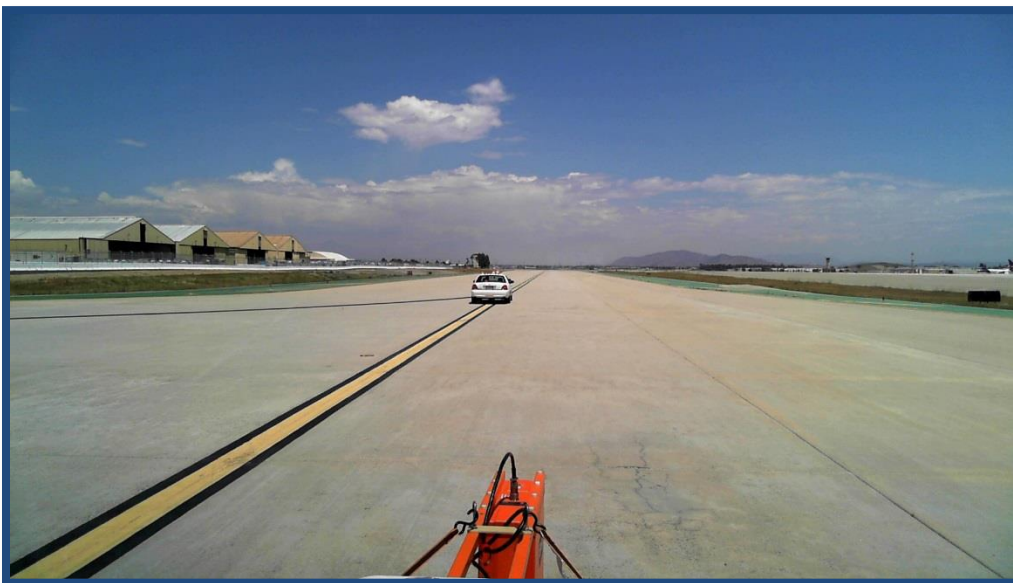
Taxiway N Representative Pavement Condition (Sta. 1+25)
